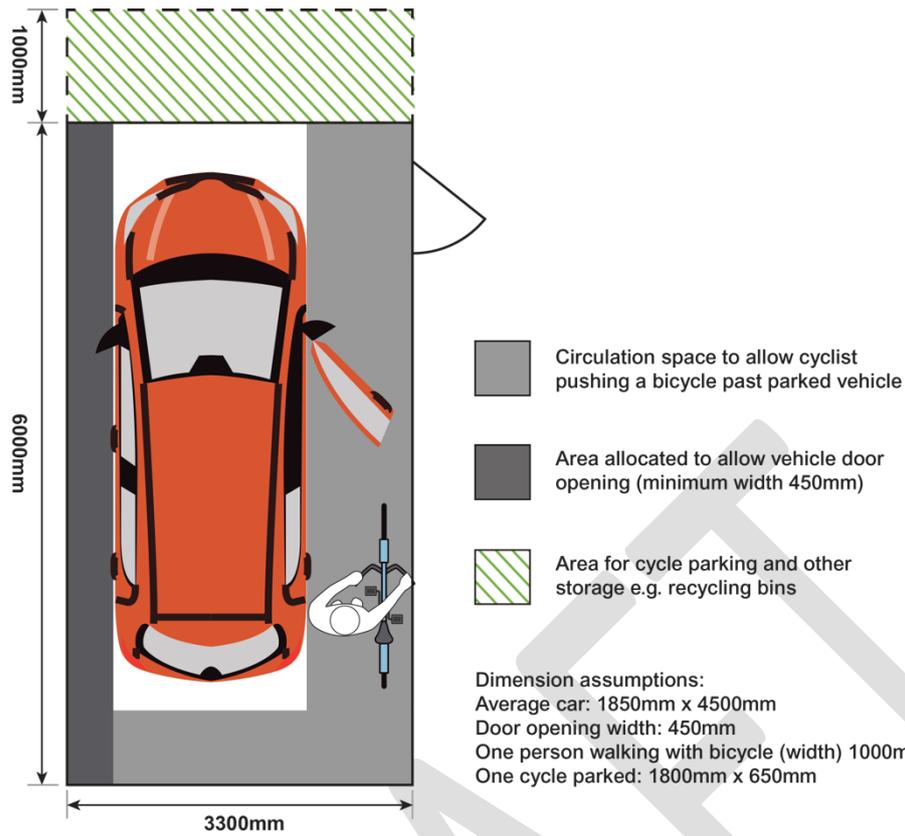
Minimum garage dimensions where parking for 2 cycles is also provided
